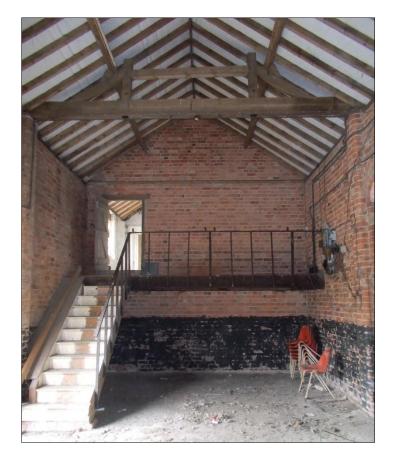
Room G4, looking south showing south wall with secondary stairs, balcony and doorway. Note also roof truss configuration and buttressing.
